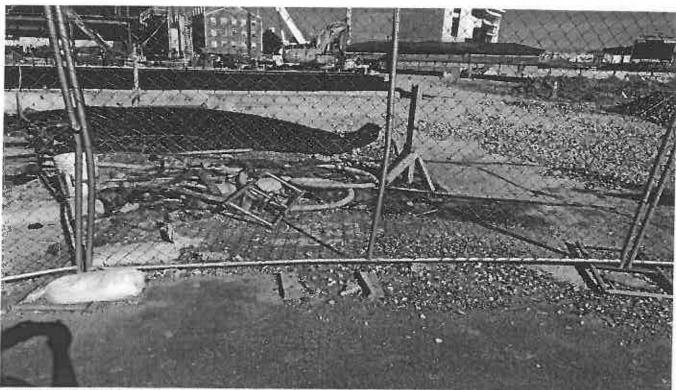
Super Silt Fence overwhelmed with pile of sediment North of the site
